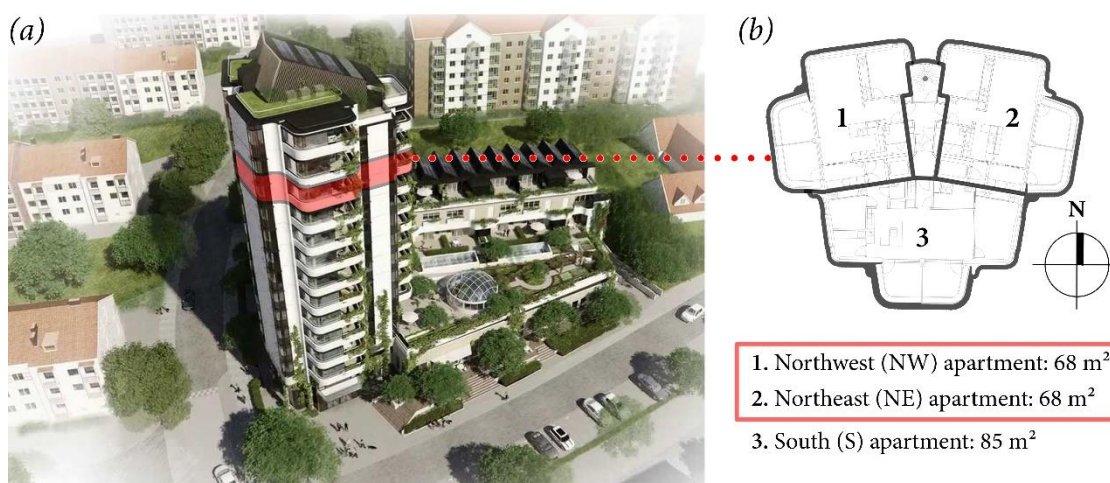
(a) Rendering of the Greenhouse apartments (*Image: Jaenecke Arkitekter AB*), (b) The studied floor division in apartments.
